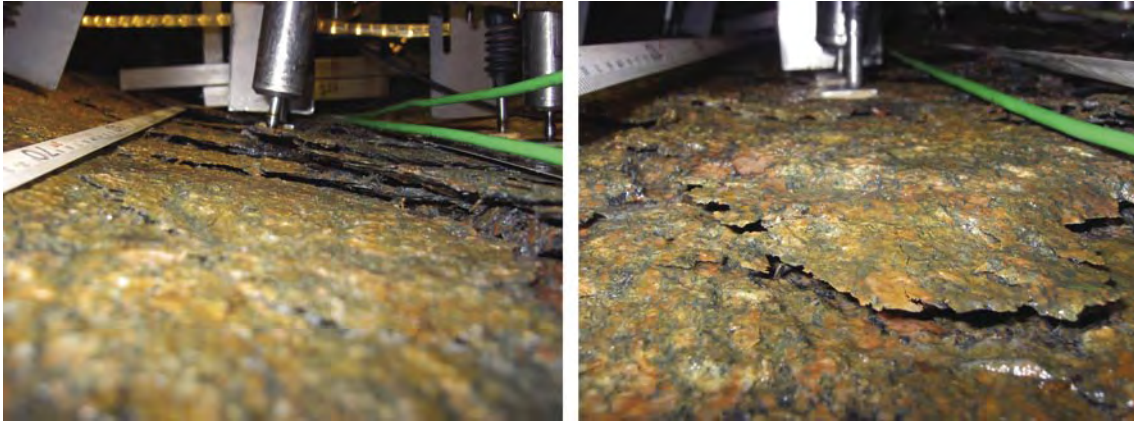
June 16. Photographs of spalling/fracturing at position #3 on the 2.5 m level (left) and at position #9 on the 3 m level (right).
